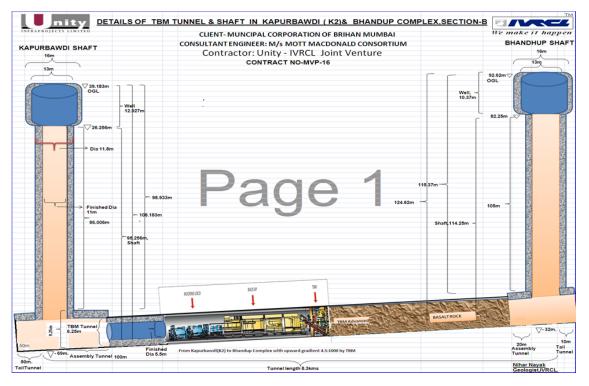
Layout of project showing shaft and tunnel dimensions and location.
